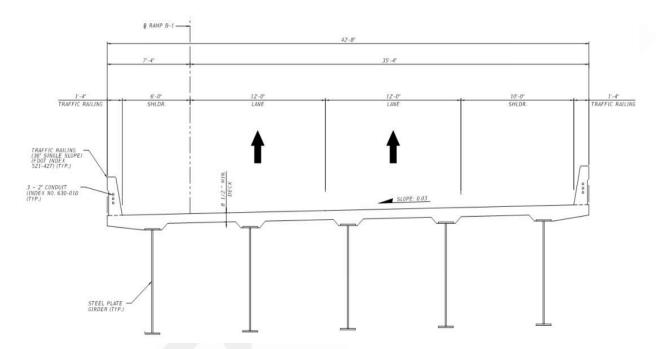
Bridge Typical Section (Bridge No. 14)
